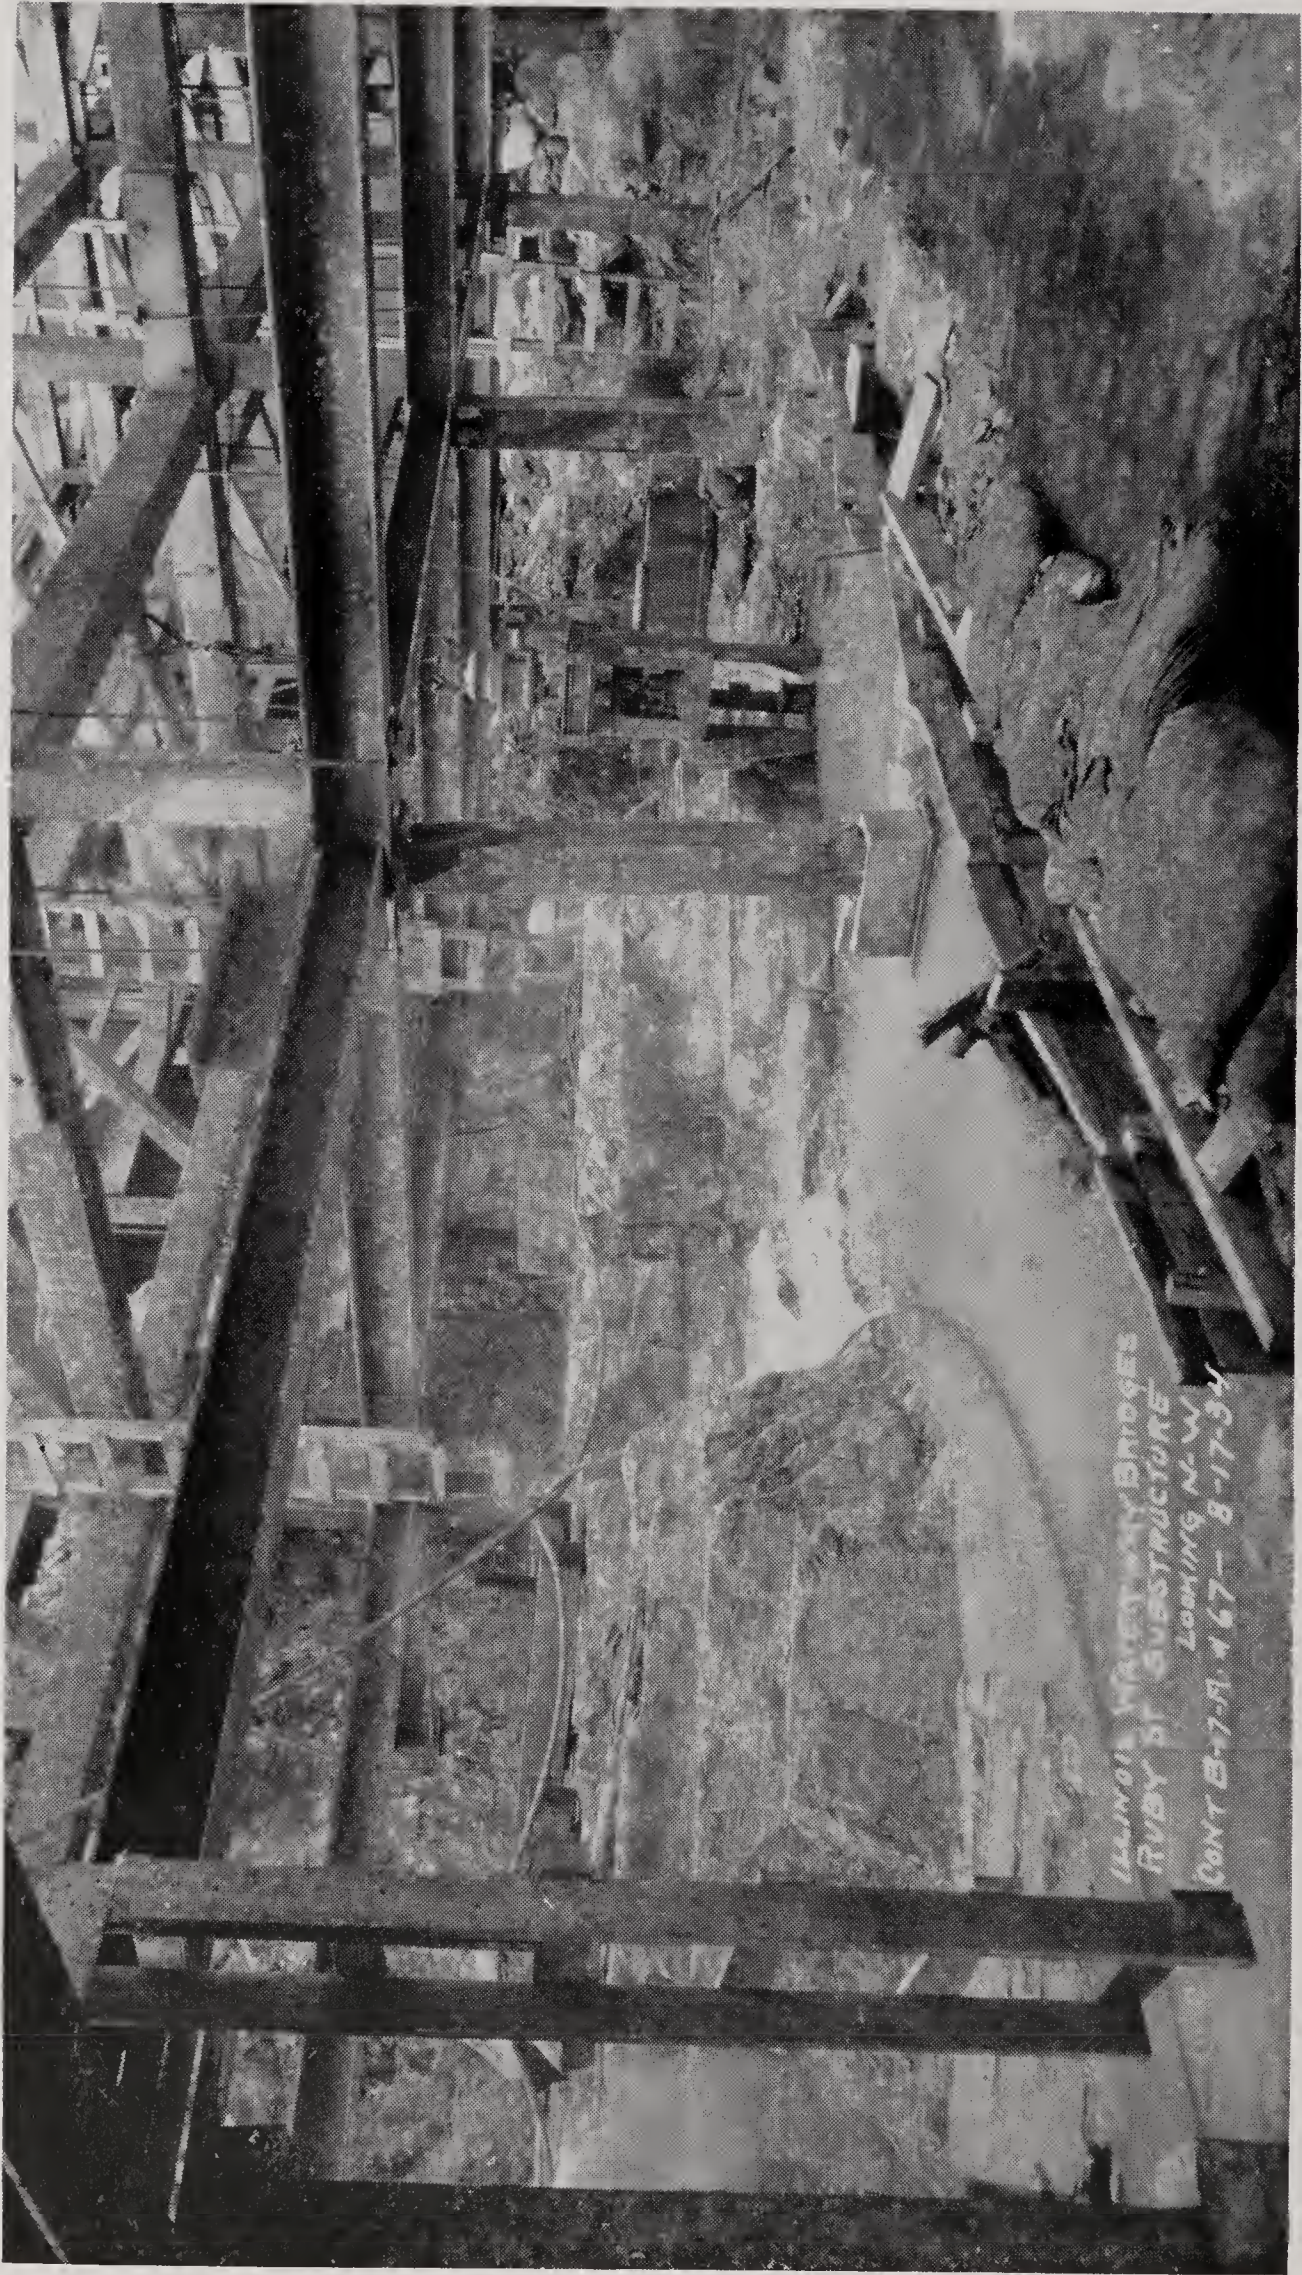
Ruby Street Bridge, Joliet. Inside view of cofferdam for east pit.
